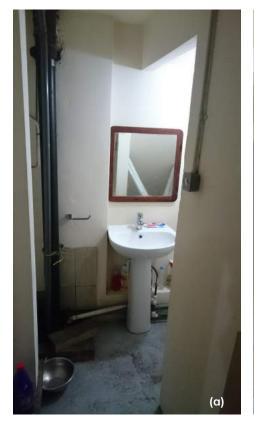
(a) - (c). Views of the basement storeroom. (a) View of the bathroom in the under-stair area with toilet (not pictured) situated around the corner.
